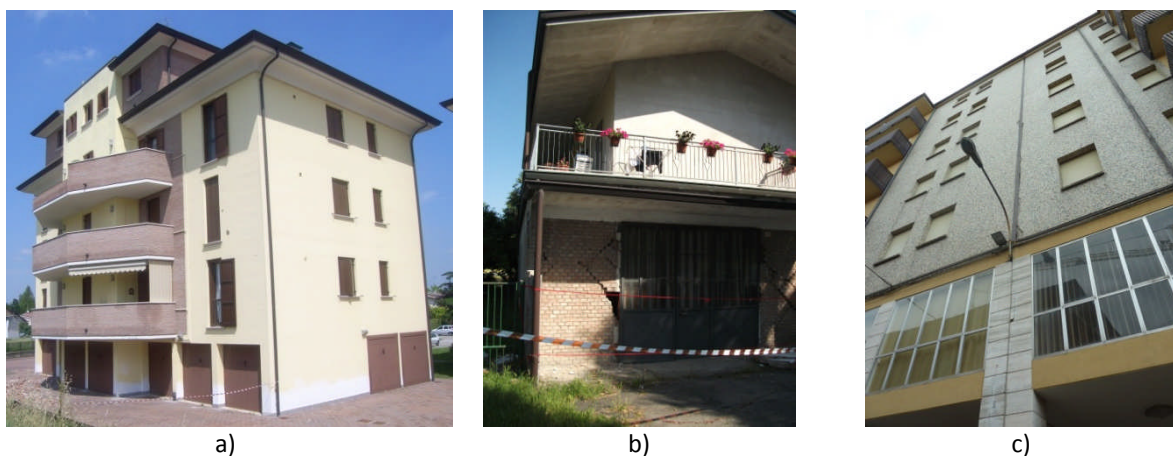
RC buildings with non-structural damage: a) balcony wall fail in Concordia b) infill masonry fail in San Possidonio; c) lower damage due to pounding in Cento.
